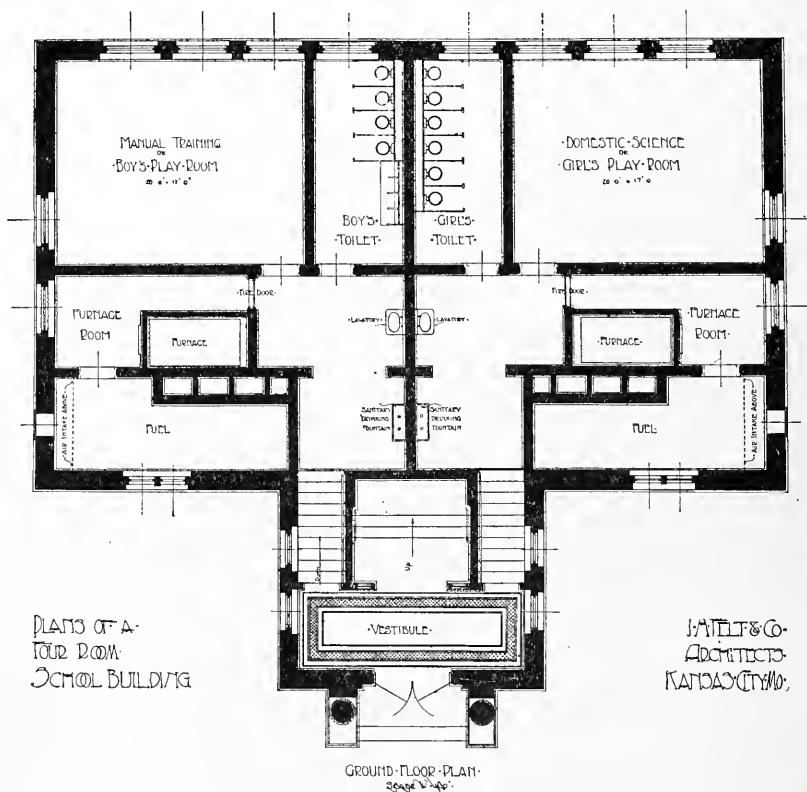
Plate V shows the basement plan and Plates VI and VII the perspective and floor plans of a four-room school building, suitable for a consolidated school or a village school.
